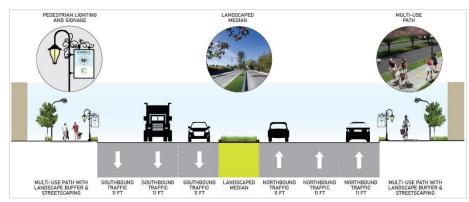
Segment B: Proposed Typical Section *(Smith Avenue to Minus Avenue)
